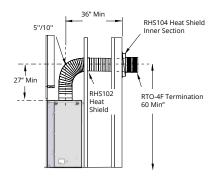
c RHS 102 & RHS 104 Installation. (Minimum requirements).
